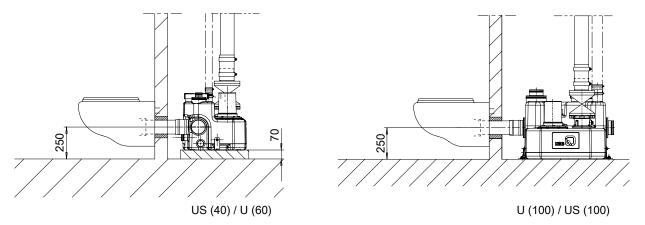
Installation information for direct connection of a mini-Compacta US40 / U60 / U100 / US100 to a wall-mounted toilet bowl
